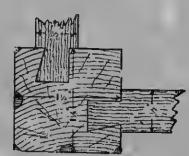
Section of Overdoor Pillar and Rail Ends.
